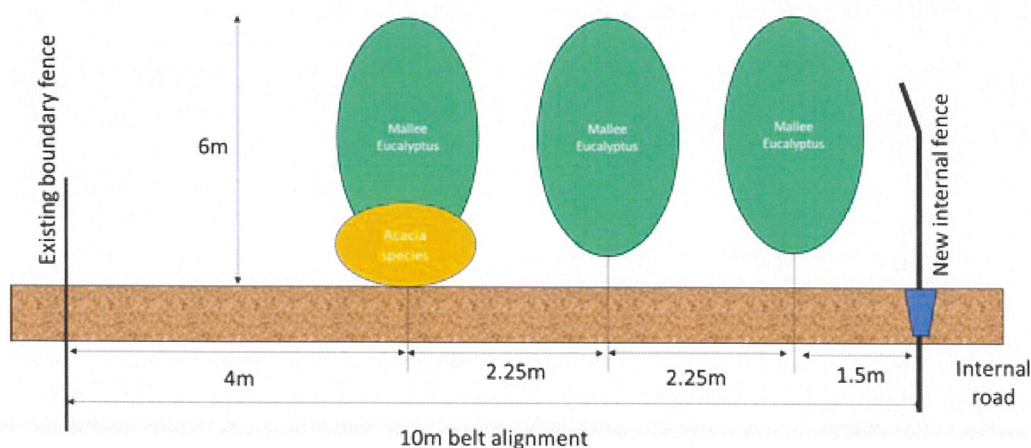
Cross-section of the proposed planted screen, showing distances within the belt relative to existing and proposed fencing.
